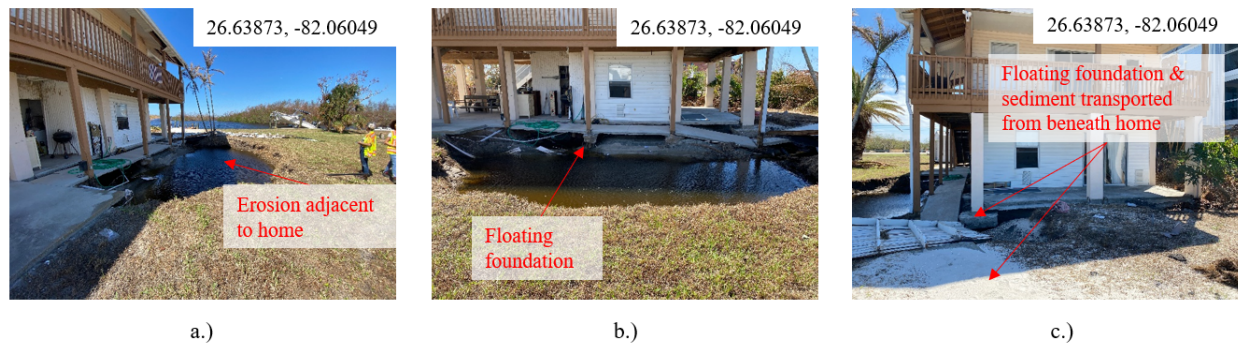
Erosion near home on Pine Island Road in Matlacha near intersection with Shoreview Drive: a.) erosion adjacent to residential home; b.) scour beneath concrete slab and unsupported deck column; c.) unsupported foundation and sediment transported to front lawn from beneath the home. Coordinates: 26.63818, -82.06133
